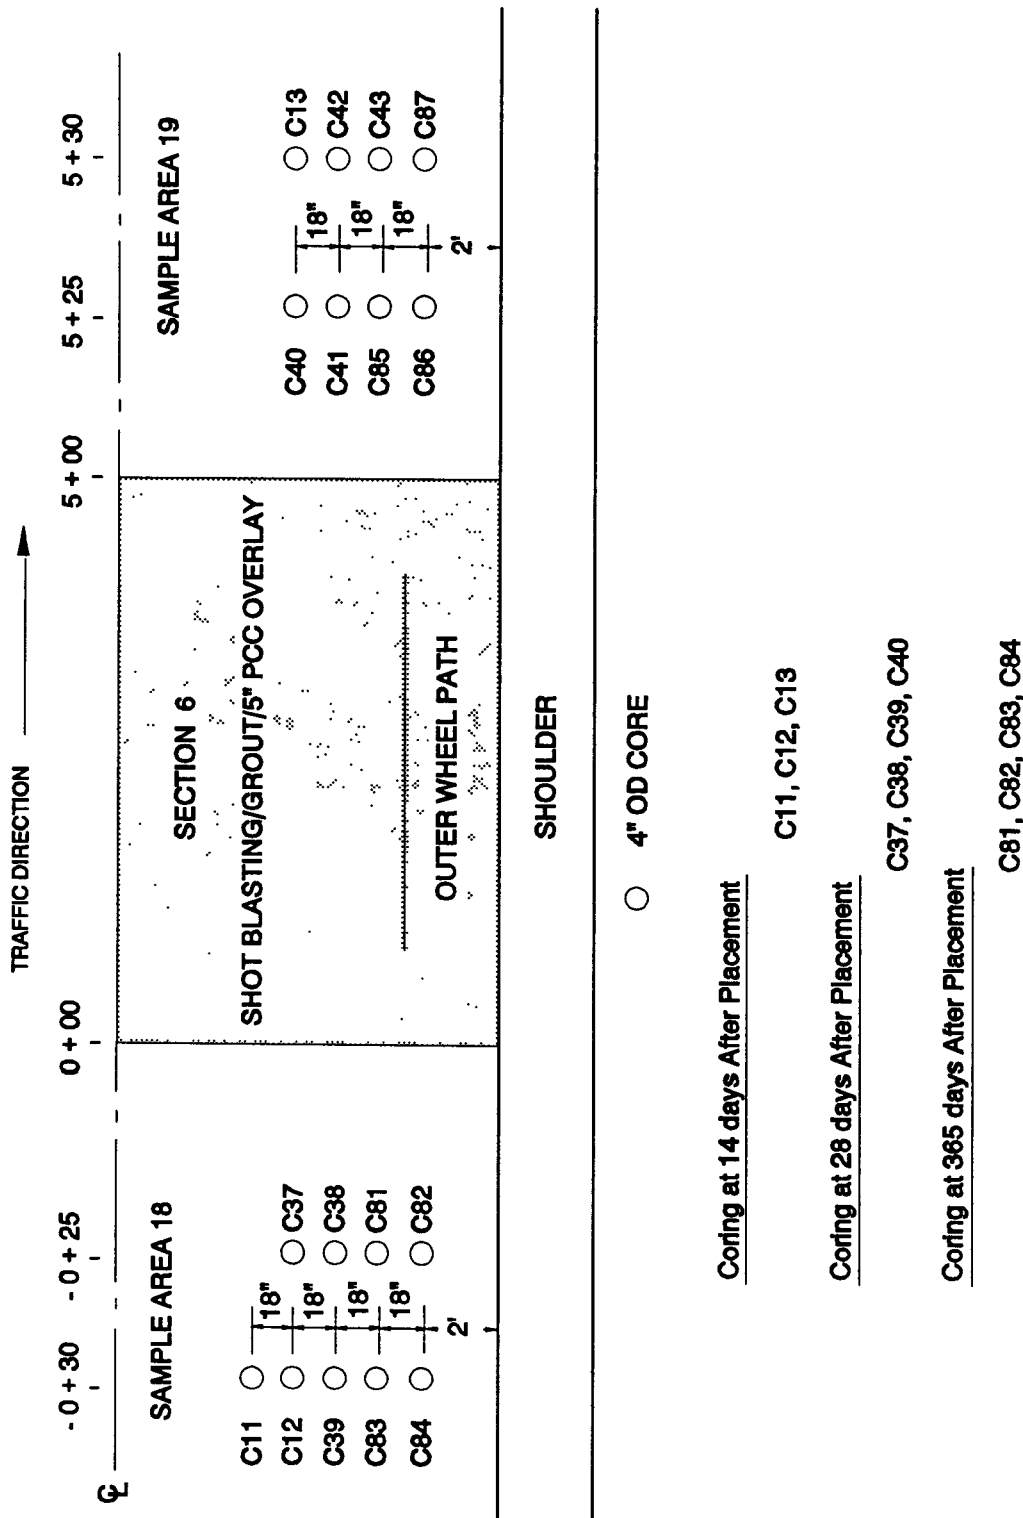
Example of "Post-Construction" Sampling Plan for Test Section 6
